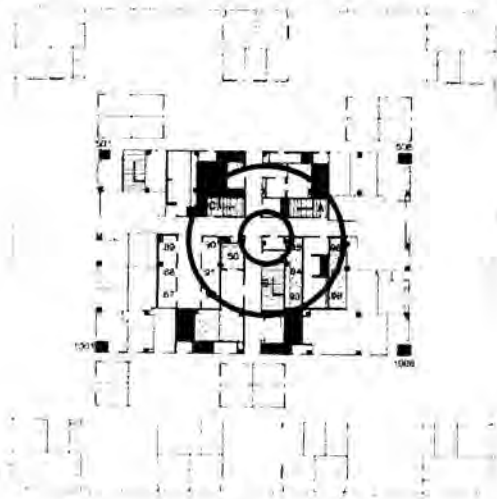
shows the floor plan for WTC1, 96th floor which had a fourth stair (in the upper left corner of the core), a convenience stair between three local floors and not serving as an exit. One of the problems in the World Trade Center towers was the close proximity of all three of the exit stairs on almost all floors and especially on the impact floors for WTC 1, including the 96th floor illustrated in Figure 1. On these floors the direct-line distance separating exit enclosures was, *at best*, only about 21 feet (6 m). Indeed if a triangle were drawn connecting the three exit enclosures, it would have an area of only about 180 sq ft. (17 sq m). This would be relative to an overall (interior) floor plan dimension of about 206 feet (63 m) per side (about 284 feet or 87 m in diagonal dimension) and an area of about 42,000 sq ft (3,940 sq m) according to my estimates.
